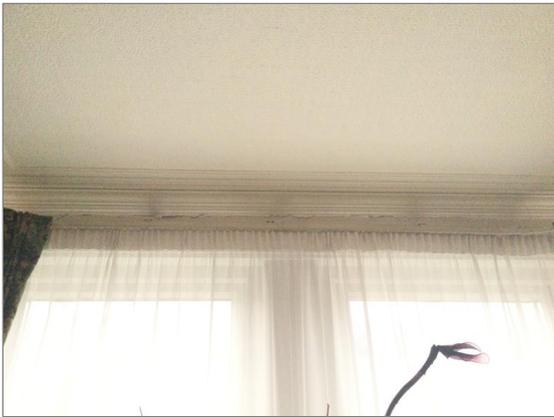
Cracking was noted to the ceiling above the bay window in the front living room
